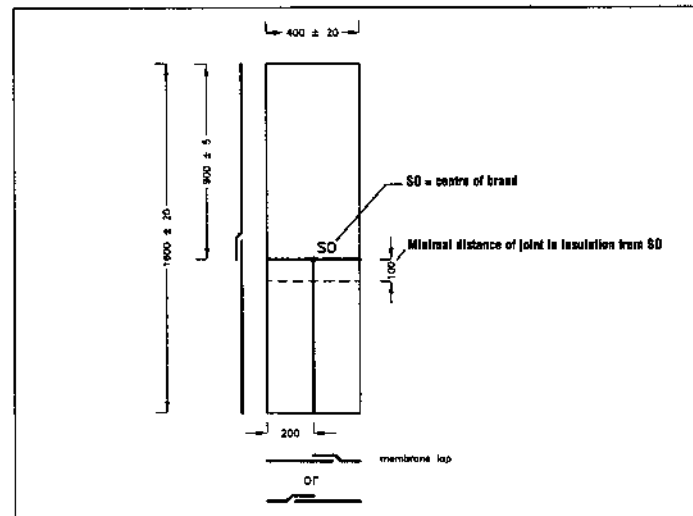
Construction build-up of the test specimen (plan view, not to scale, dimensions in millimeters)
